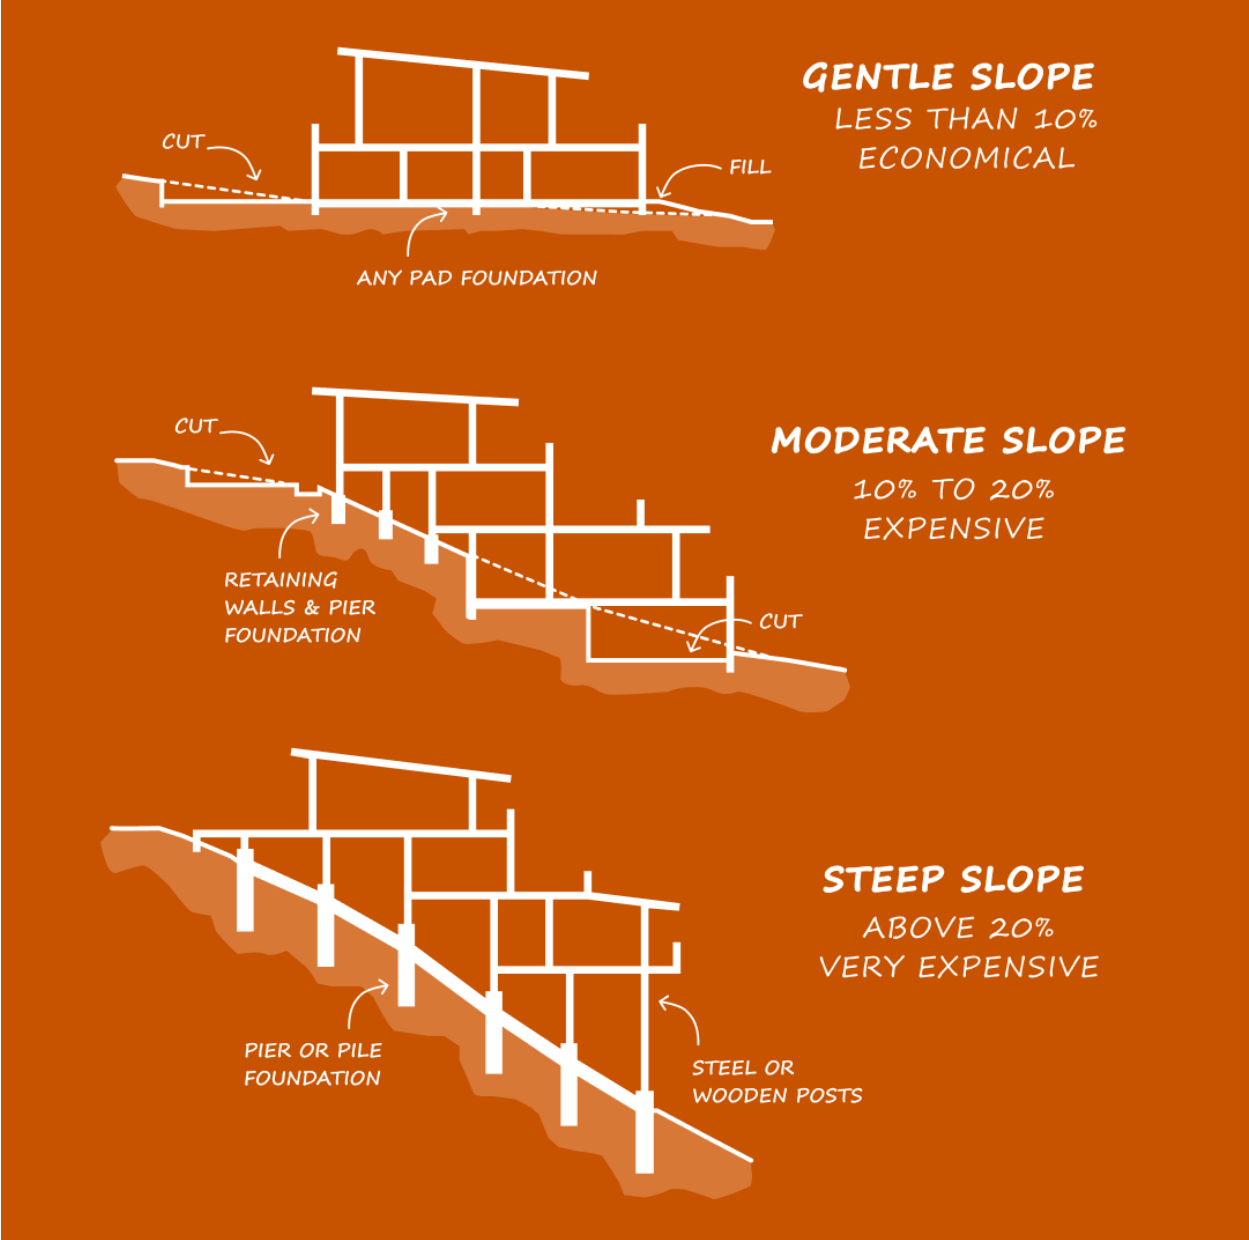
A detail of how the build on a slope which will come in play when construction happens for the agriculture academic building and agriculture research facility.
